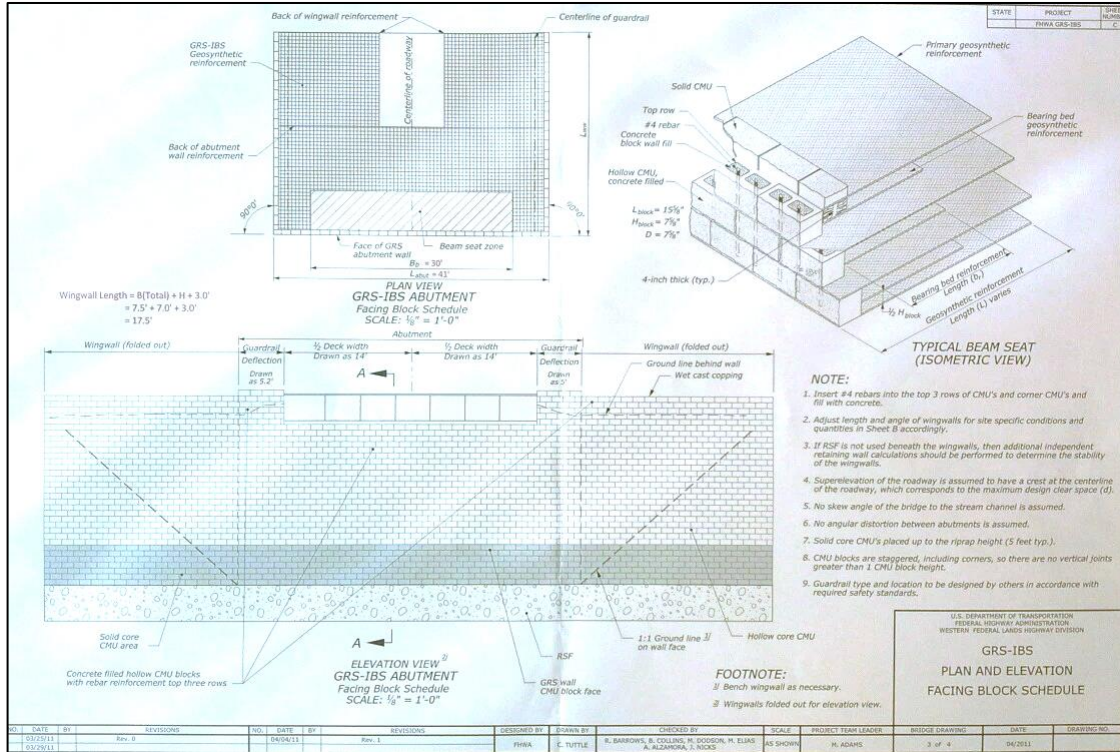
As-built drawings for GRS-IBS Bridge No. 2 in Kay County
